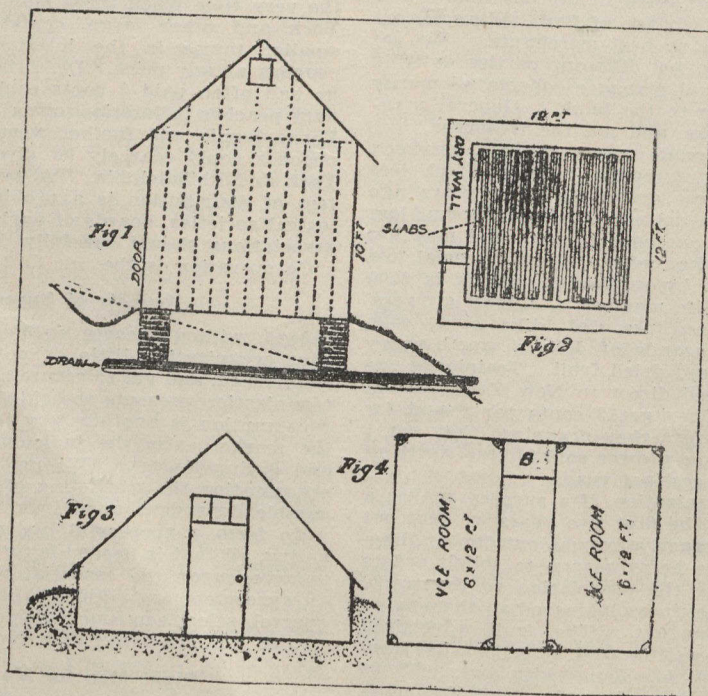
ICE HOUSES. (1) BANK ICE HOUSE; (2) GROUND PLAN; (3) A CHEAP ICE HOUSE; (4) GROUND PLAN OF SAME.
